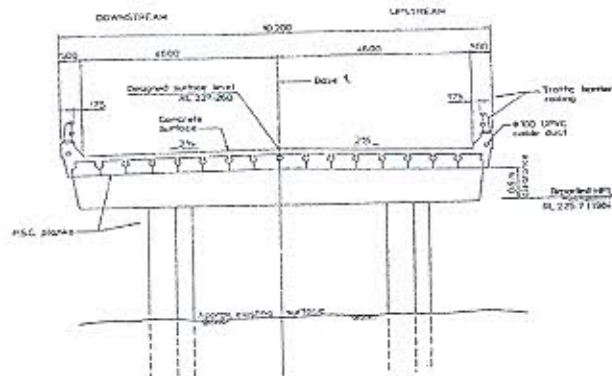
Cross section of the bridge deck at a pier, showing arrangement of planks
